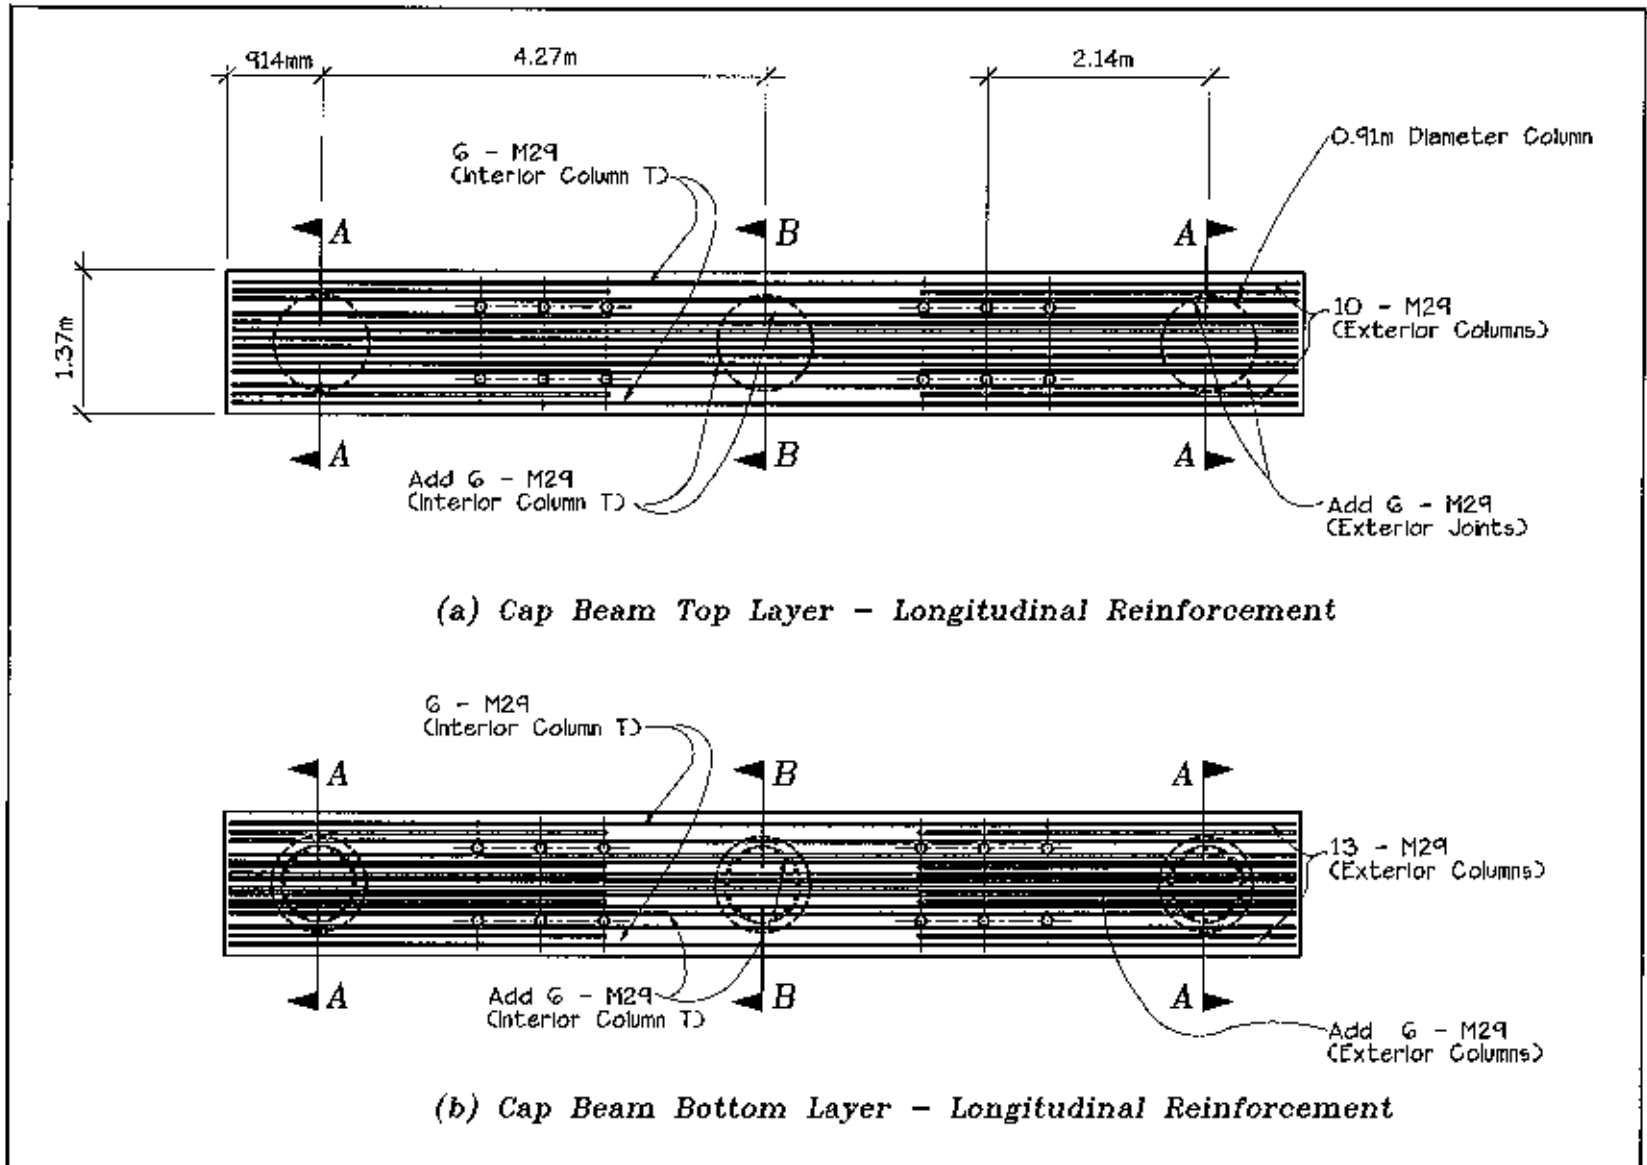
Cap Beam Top and Bottom Layer Longitudinal Reinforcement
